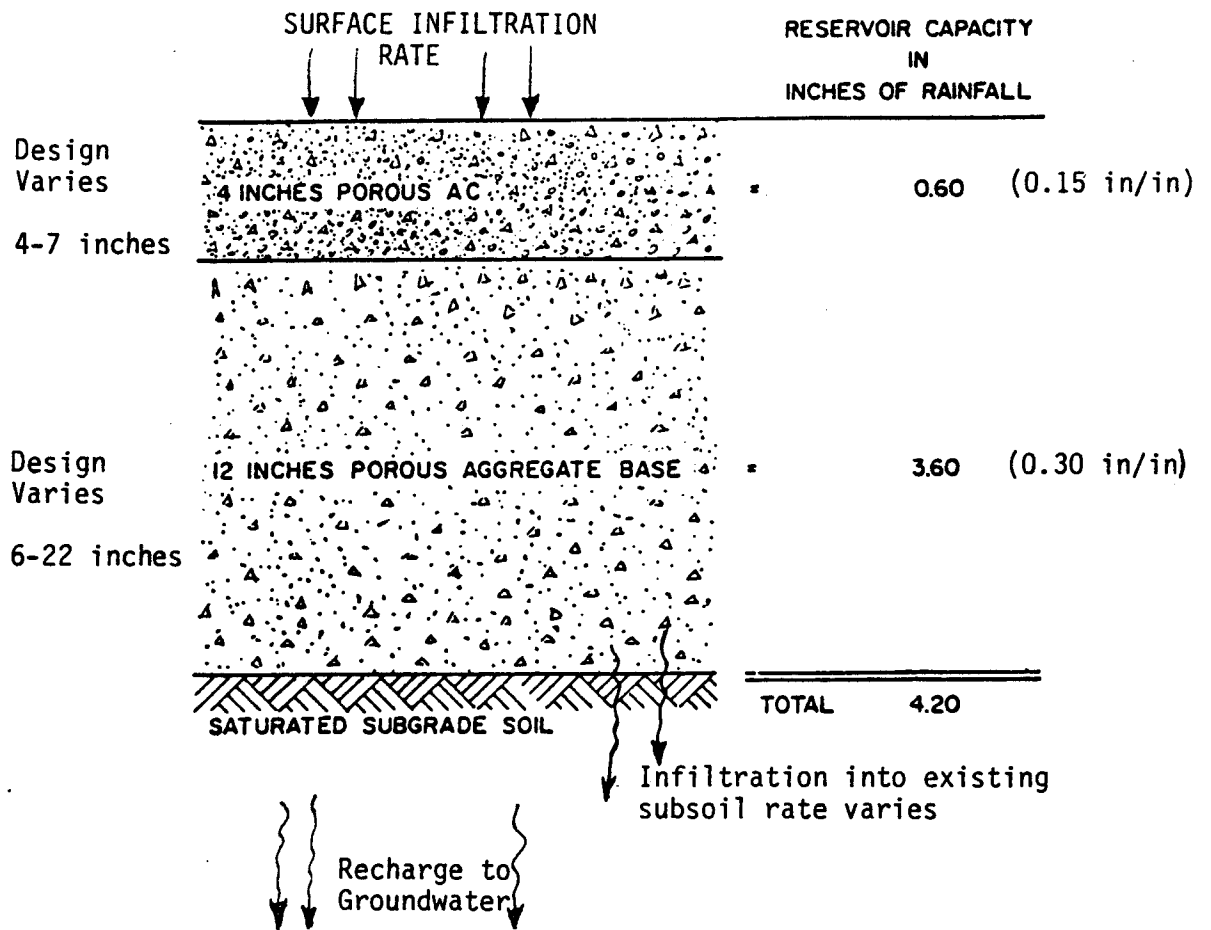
Typical Porous Asphalt Concrete Parking Lot Pavement (After Hannon, 1980)
